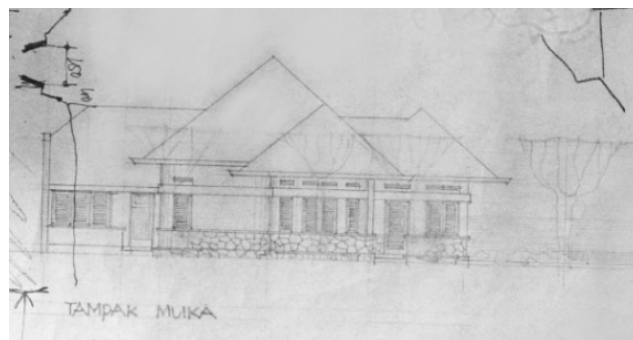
Front elevation of the former house of Residence of Lie A Hong (December 31, 1968)²⁾
